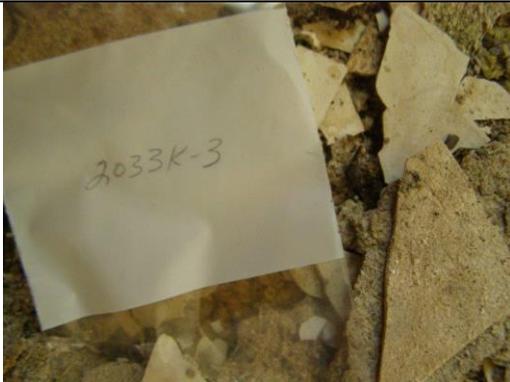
Plaster (2033K-3) Living Room, Ceiling.
